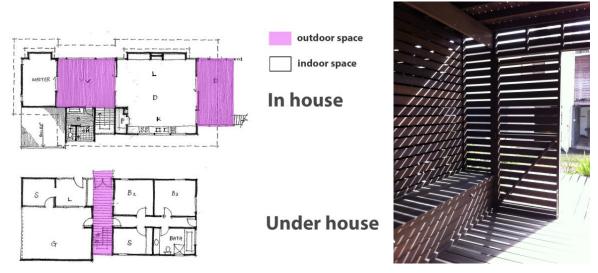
The pattern is of sequential movement through the indoor and outdoor spaces in the design (Left). The walkway/entry is a semi-open transitional space from communal spaces to private living spaces (Right) under house.
